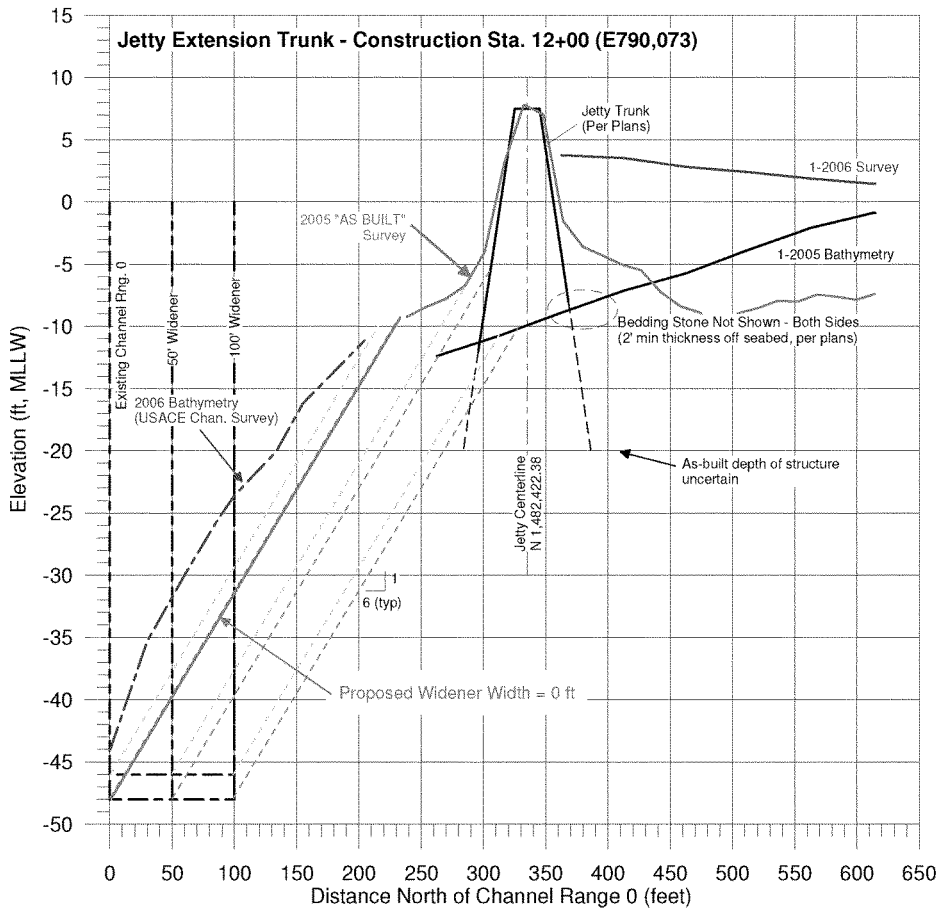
Proposed widener at USACE jetty Station 12+00 relative to the north jetty – jetty position is based upon the 2005 as-built survey and construction drawings.
